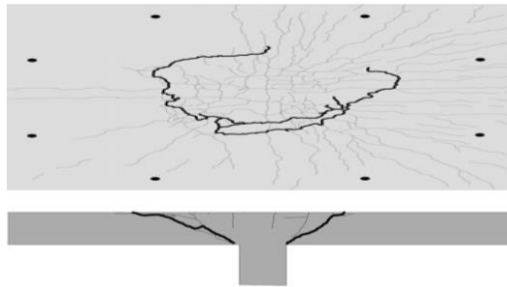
Typical punching shear failure (Guandalini, Burdet, and Muttoni, 2009)
